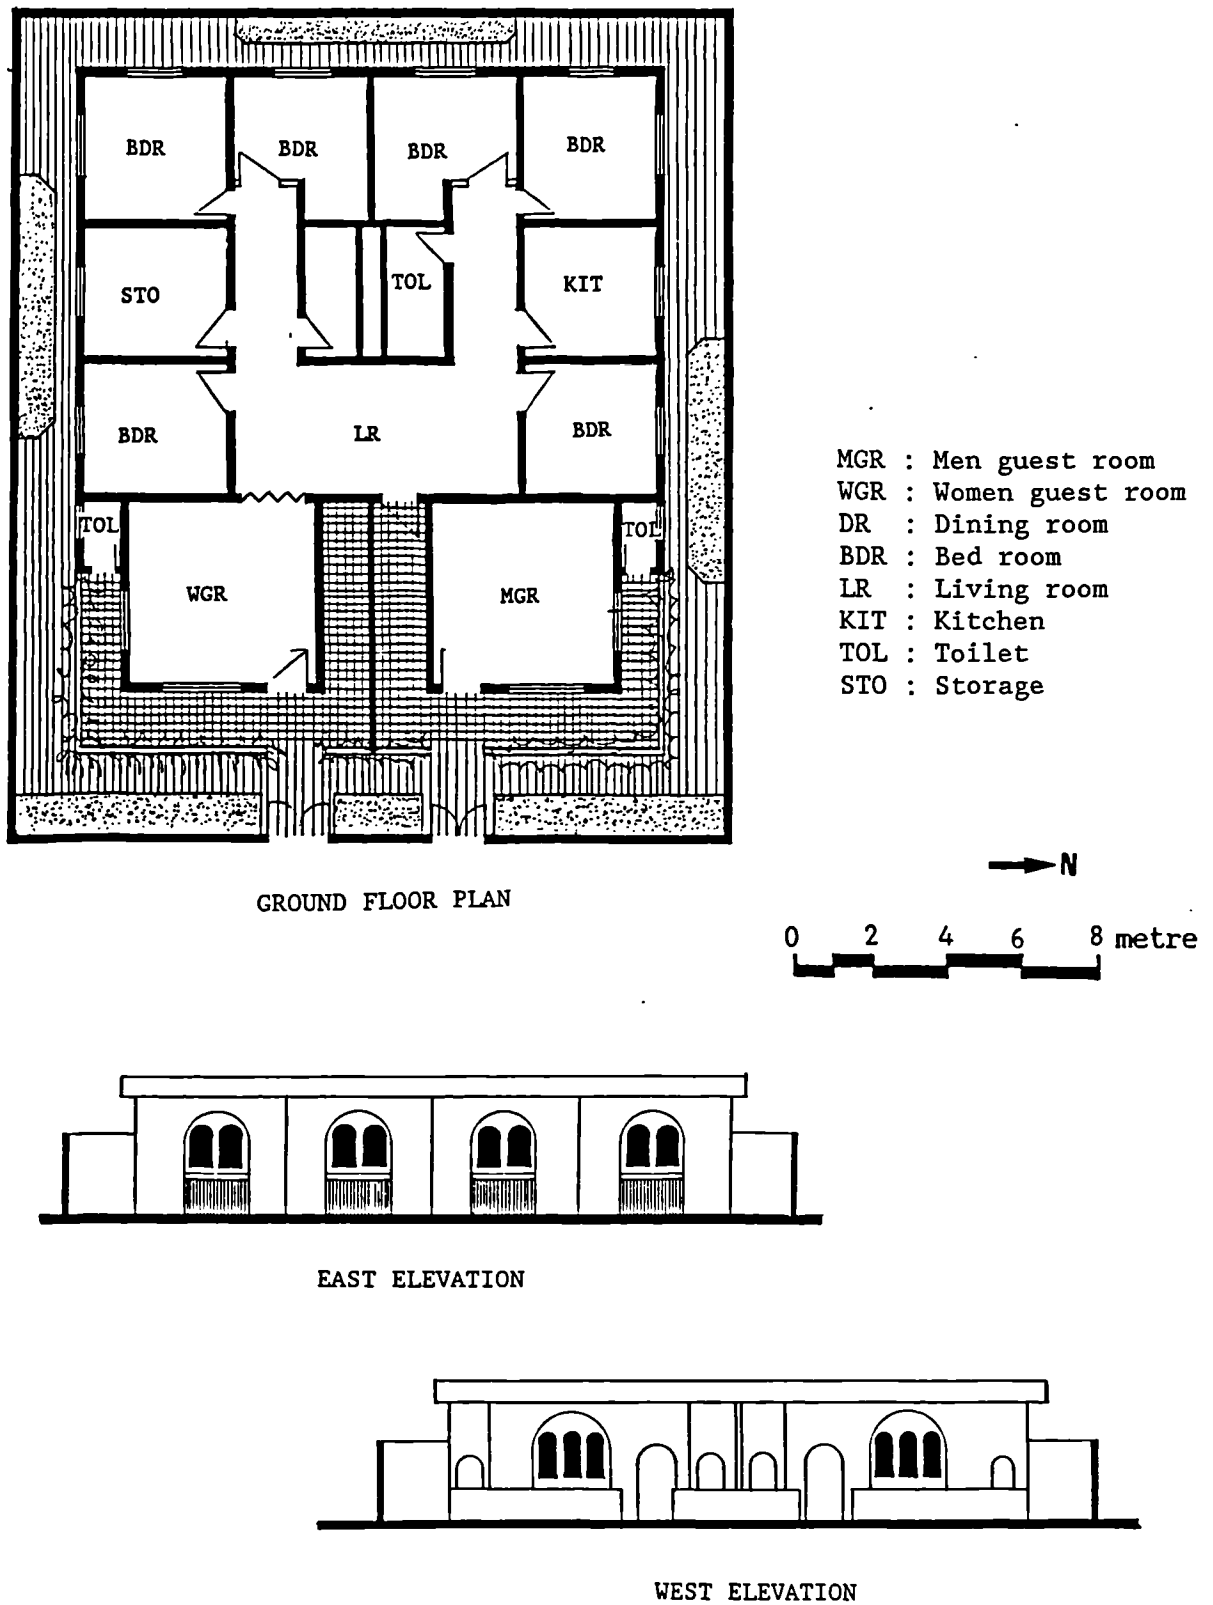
B: FLOOR PLAN AND WEST AND EAST ELEVATIONS OF HOUSE 6.
